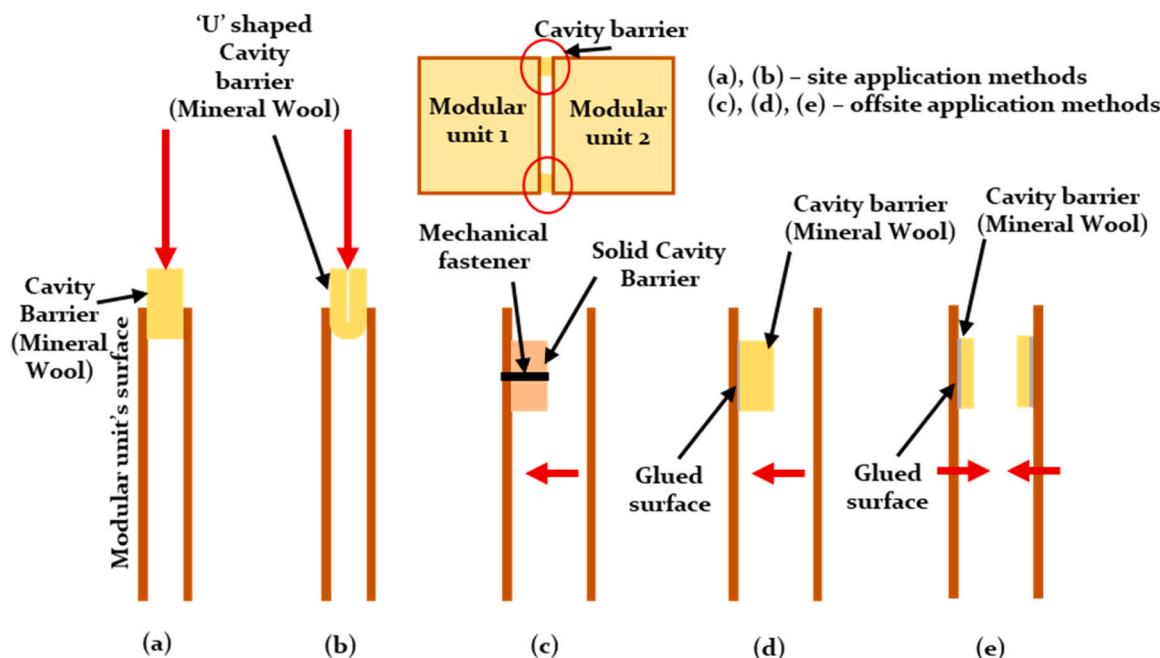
Cavity barrier installation methods used in modular buildings [122].
